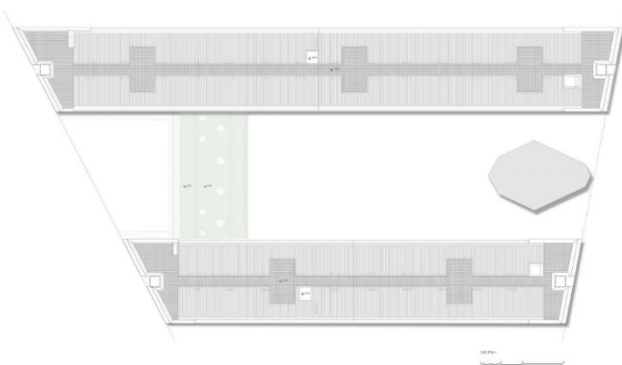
Istanbul City University Dormitories Layout Plan. (URL 16)
